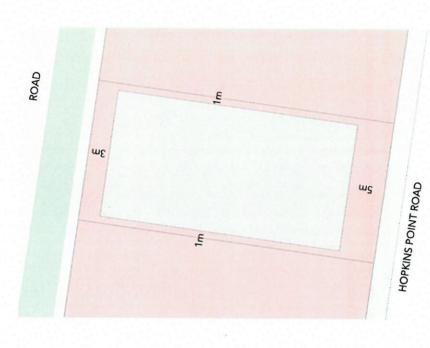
Conventional Residential Lots Building Envelope (Hopkins Point Road)
